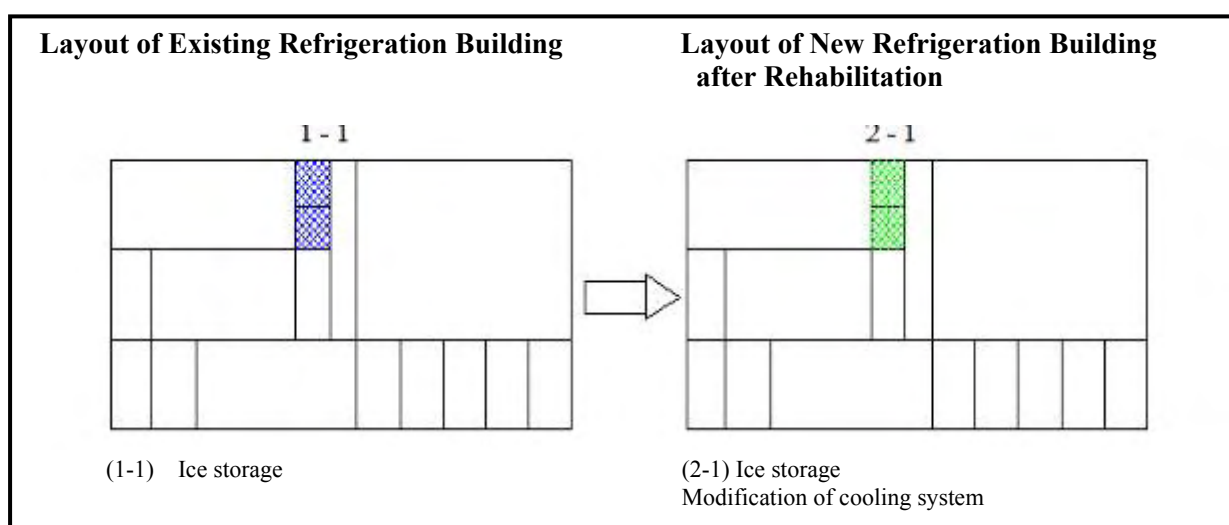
Existing Layout and Proposed Design of Refrigeration Facilities (Davao)
